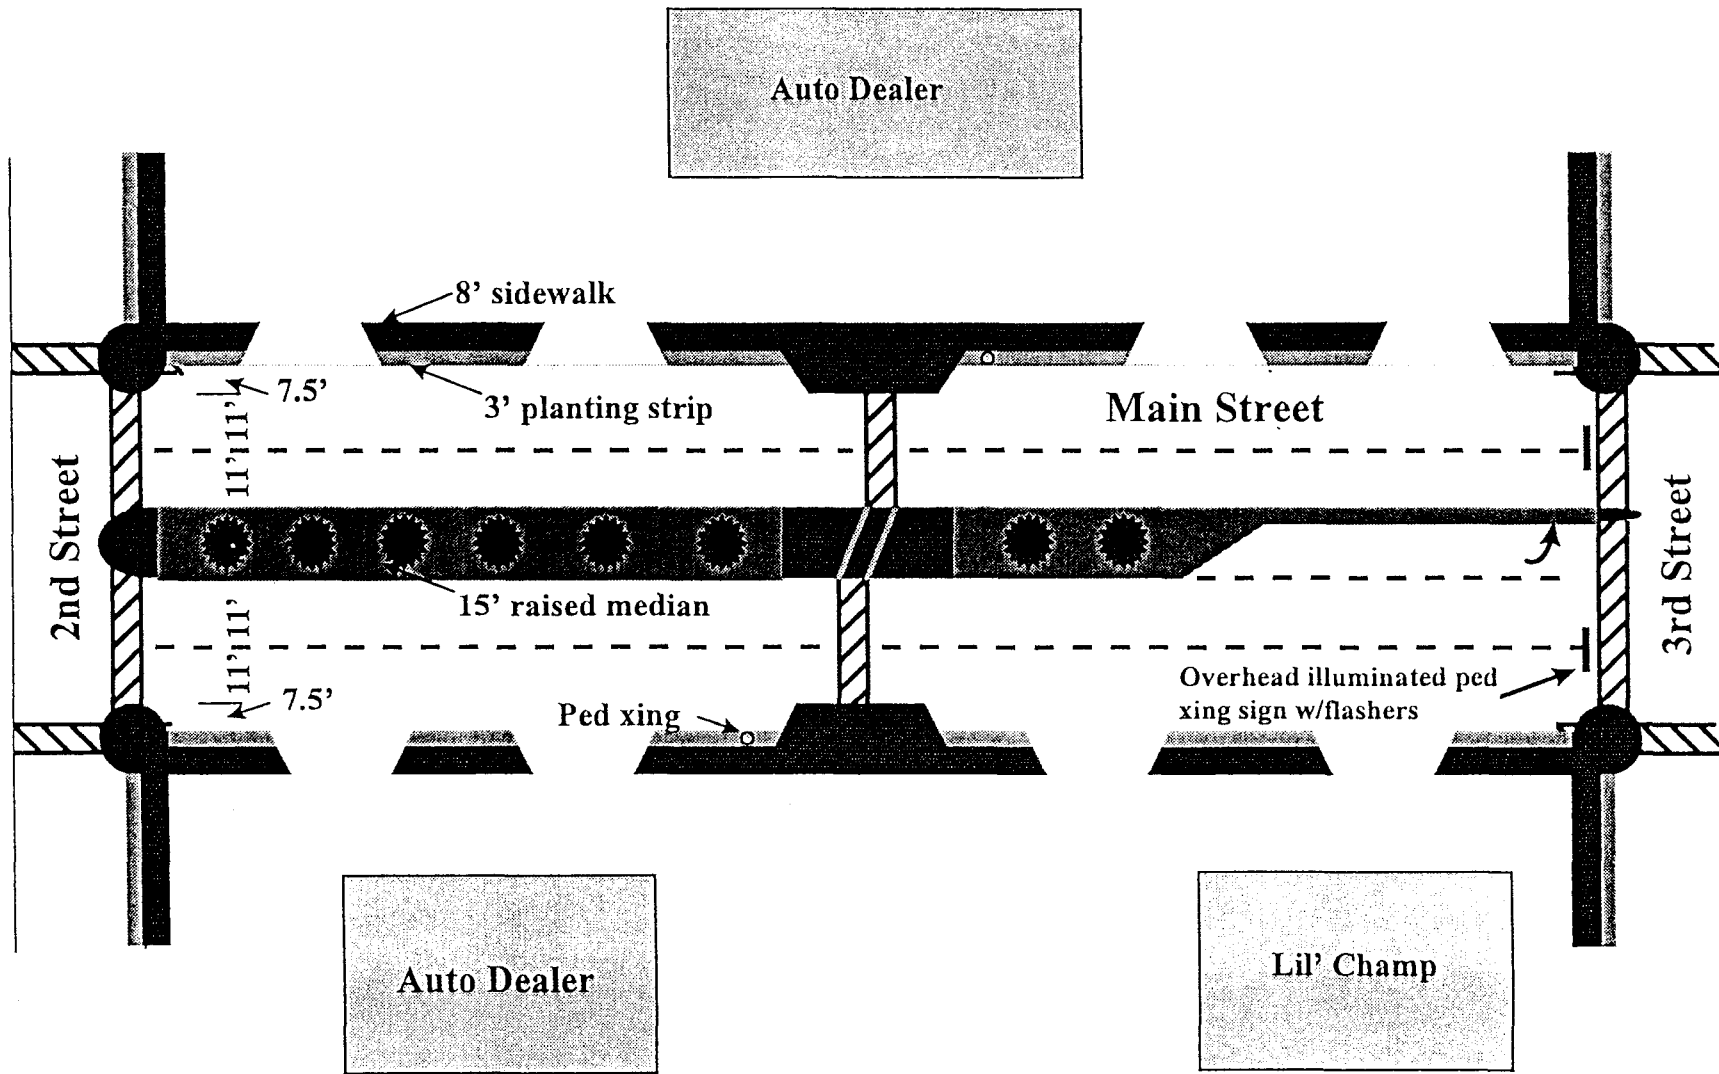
Recommended cross-section design for Main Street between 2nd and 3rd Streets.
